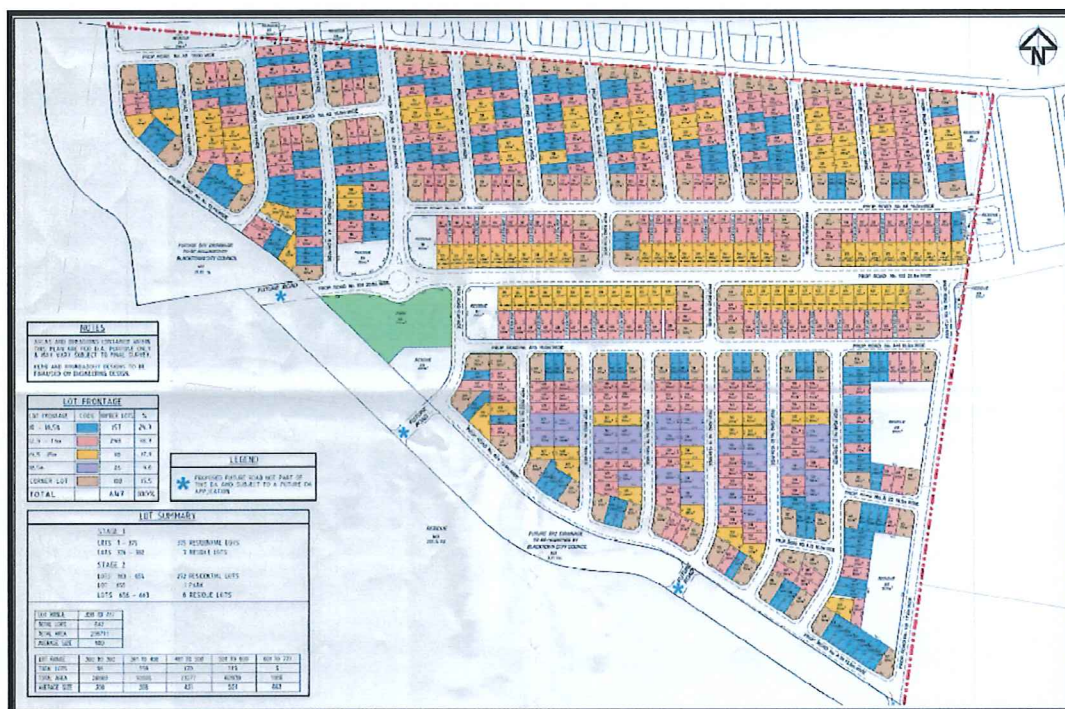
Proposed subdivision (Source: Calibre Consulting)
